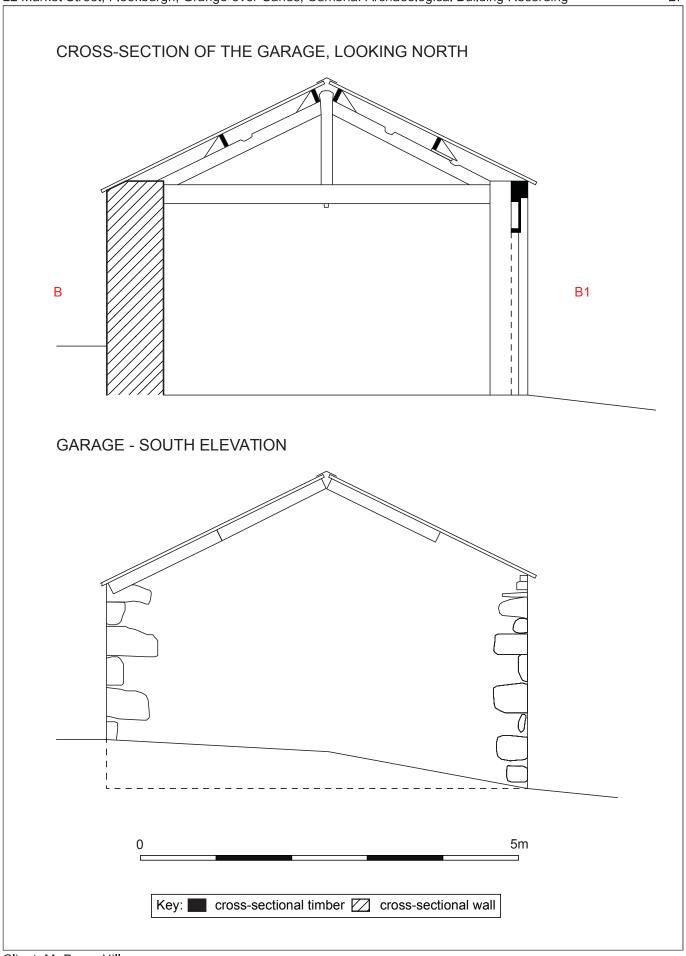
South external elevation of the garage and cross-section of the garage, looking north
